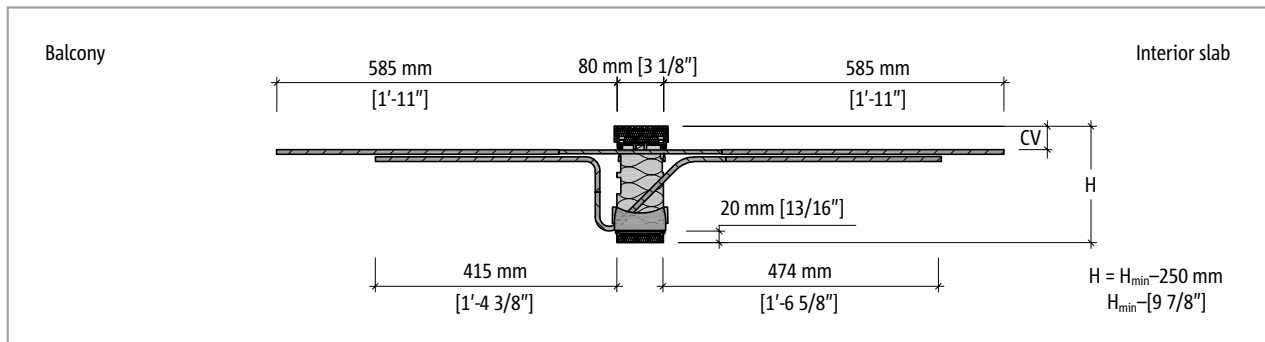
Schöck Isokorb® T Type CK-M1-V2 to M6-V2: Product cross-section
